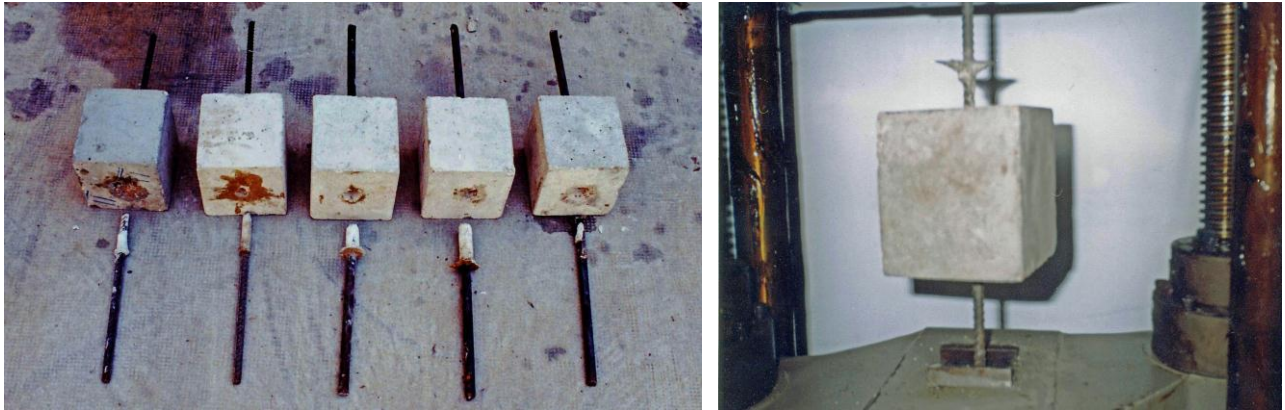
Bars completely slipped out of concrete indicating bond failure at early ages.
